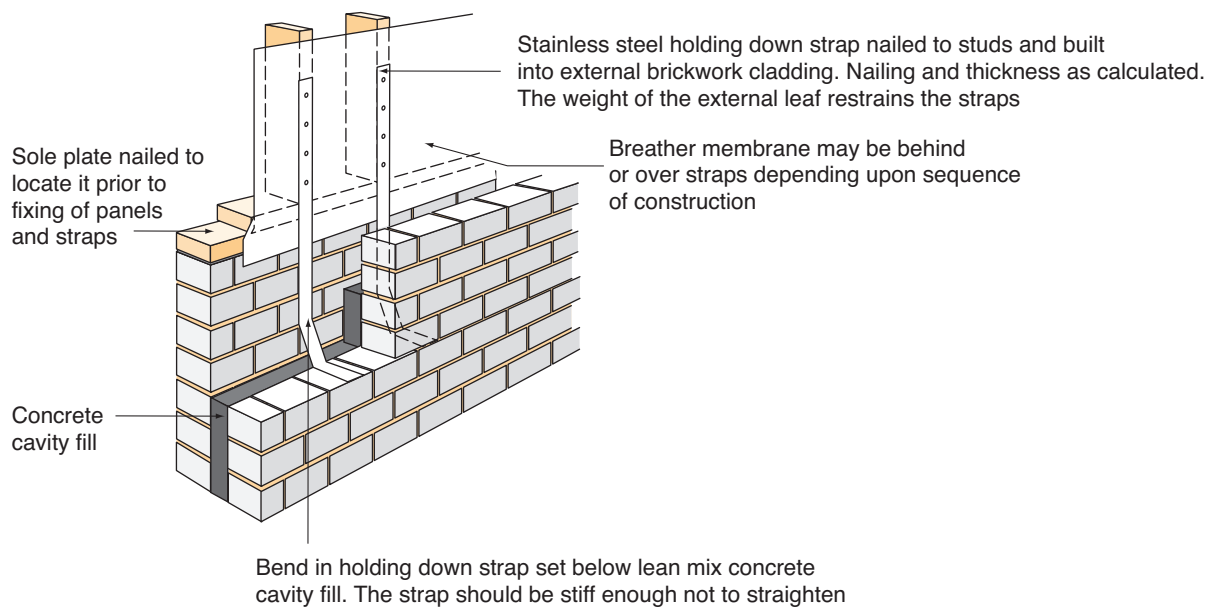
Some methods of attaching a wall plate to the foundation
